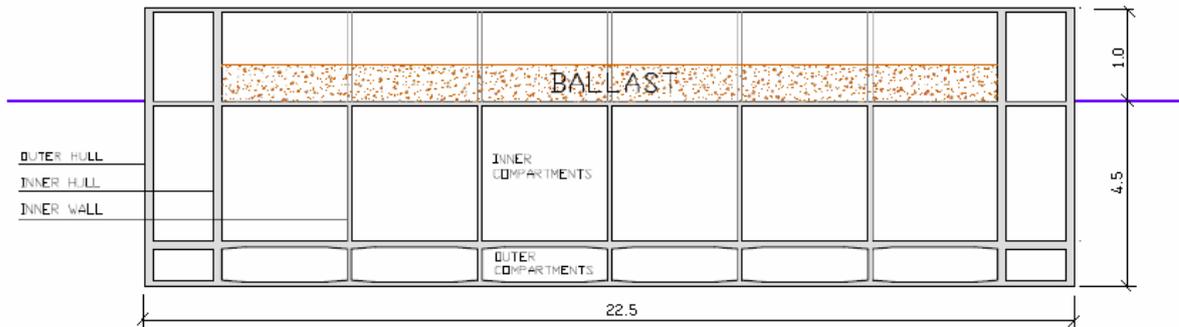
Layout concept for floating breakwater section. Source: van Tol (2008), p.79.
